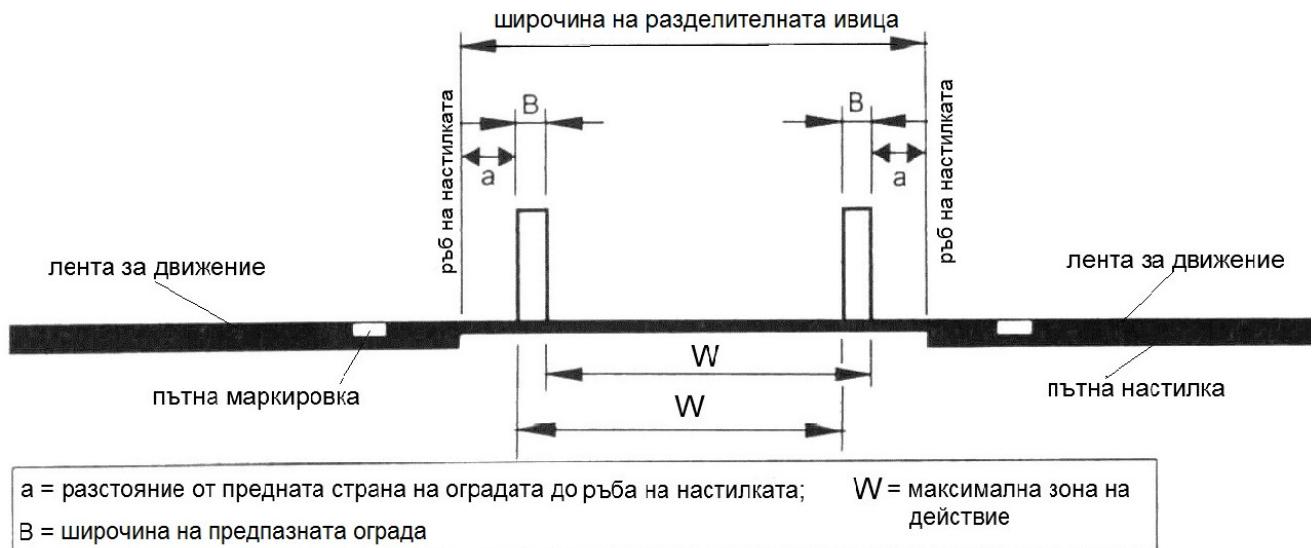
One-sided road restraint system for split-action roads located to the edge of the pavement
